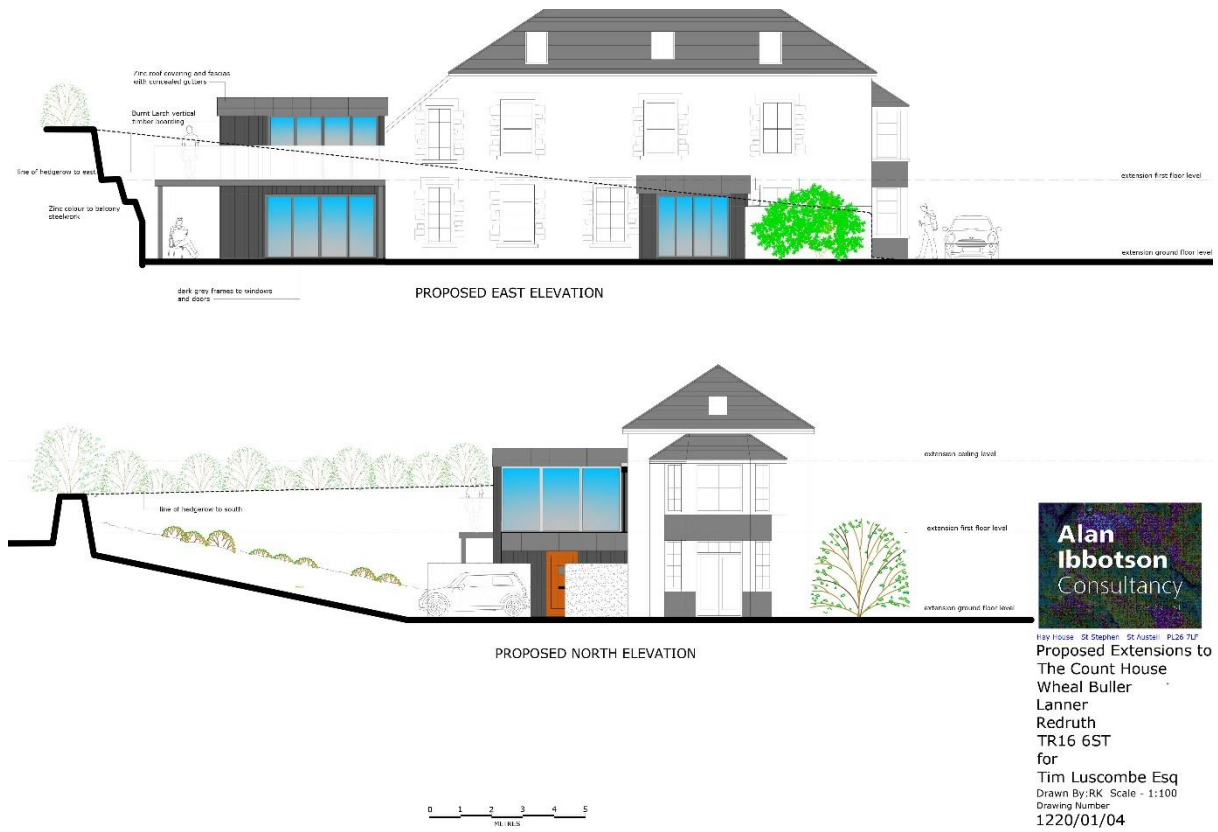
East and north elevation drawings showing alternative proposals (design 2).
